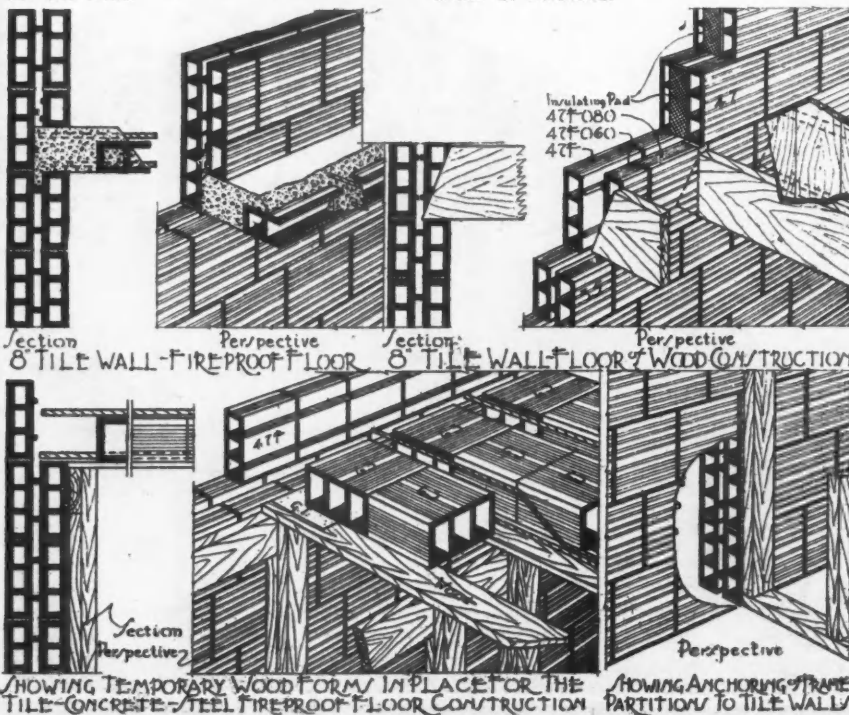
Detail Sheet, Showing Joist Setting in Tile Construction.
